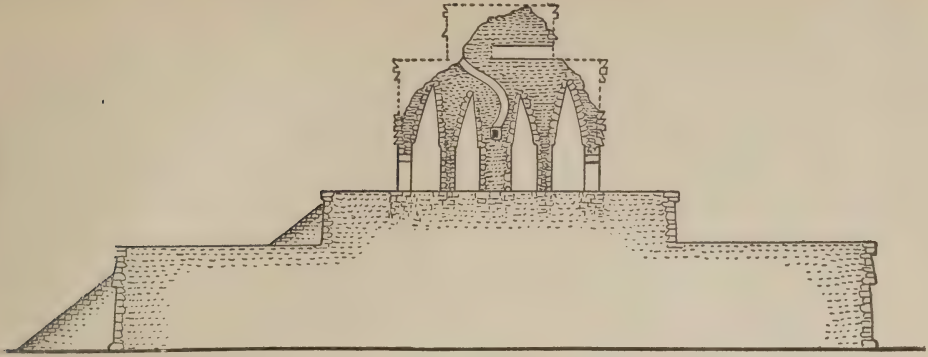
SECTION OF ROUND TOWER OR CARACOL.
